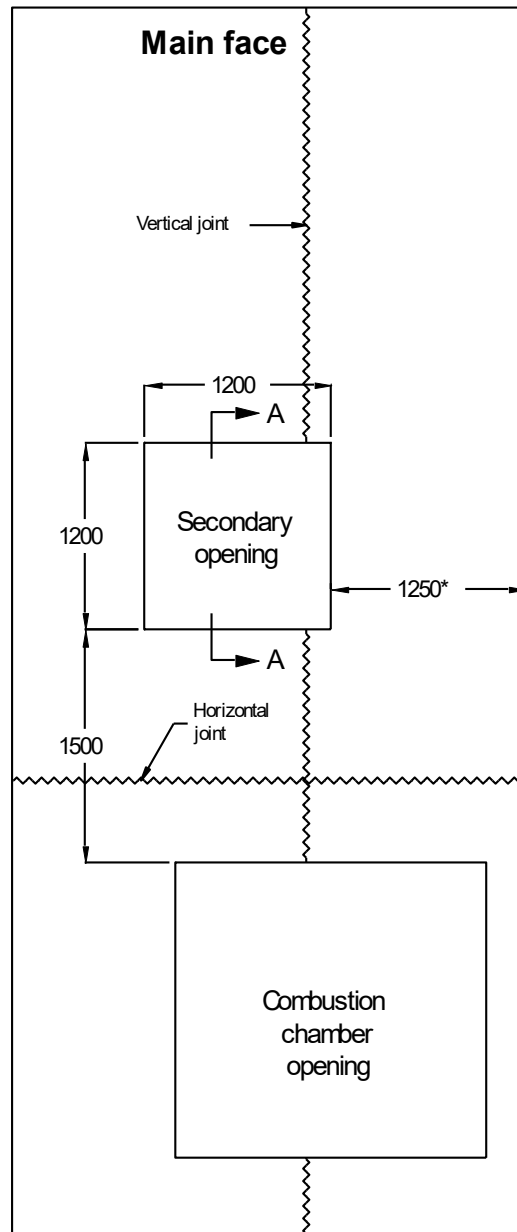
Main face with secondary opening including the location of vertical and horizontal joints. Distances in the drawing shall be considered with a tolerance of ± 50 mm except the vertical distance between corner and secondary opening which is 1250 ± 100 mm.
